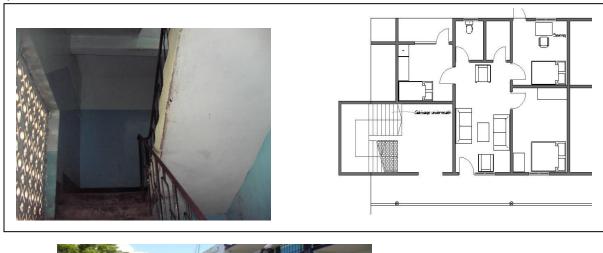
A reorganized staircase adjacent to a typical apartment in I-shaped block in Kilwa road housing estate
